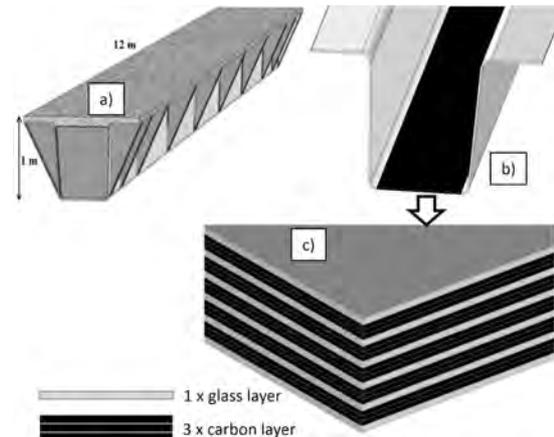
Diagram of bridge girder: a) outline, b) location of GCFRP composite, c) layer arrangement in GCFRP composite
